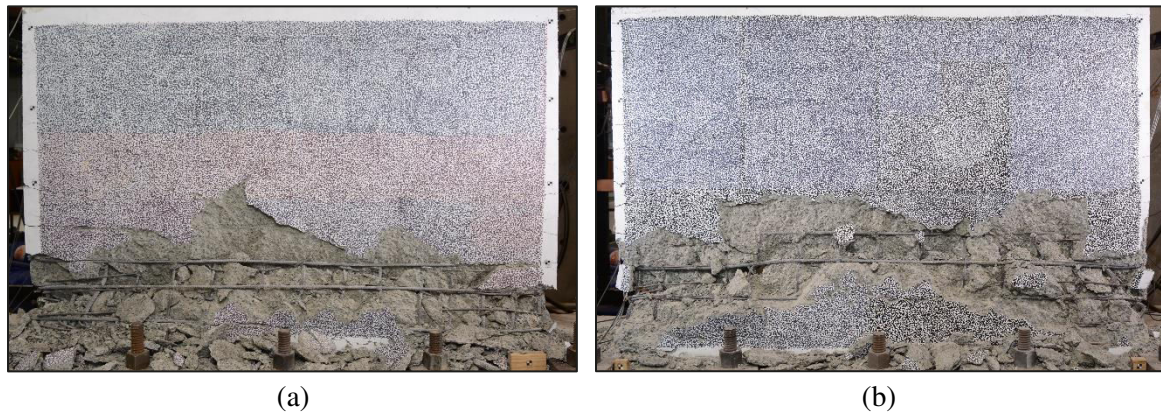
Damage at the end of the tests, (a) wall W5D-R and (b) wall W6C-R.
